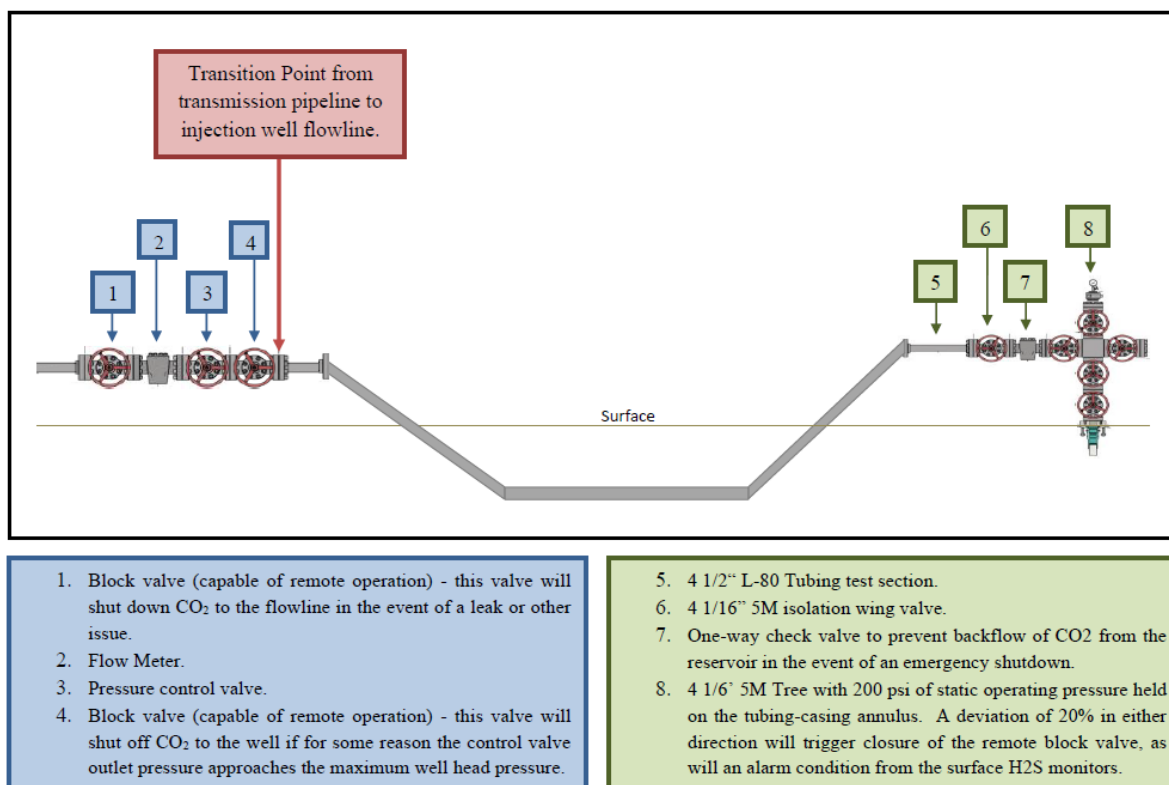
Diagram of surface connections at the Coteau 1 wellsite. The Coteau 2 through 5 wells will connect to a common gathering system at the Coteau 1 well pad. The Coteau 6 will be similarly equipped but will connect to a separate gathering system. The primary block valve (item 1 above) will be located at the Coteau 1 well while the rest of the equipment (Items 2 through 8 above) will be located on the well pads of each of the injection wells.
